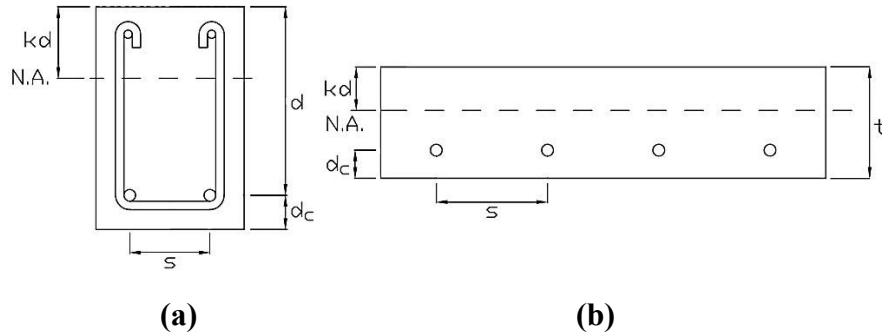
Typical cross sections for: (a) beam specimens; and (b) slab specimens
